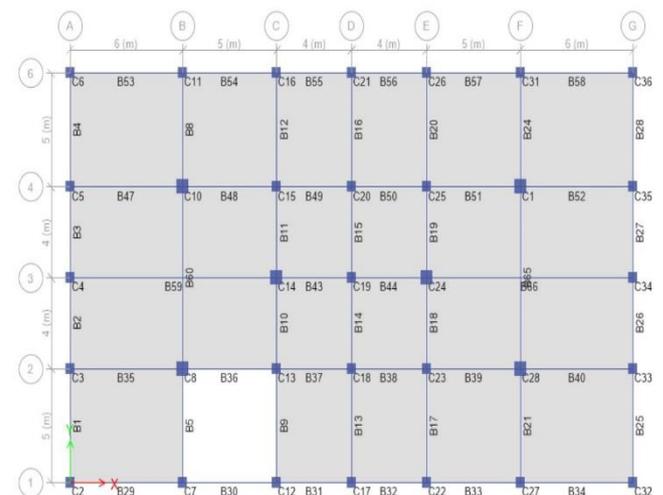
2D Plan View of RCC Model 2 At Storey 2
